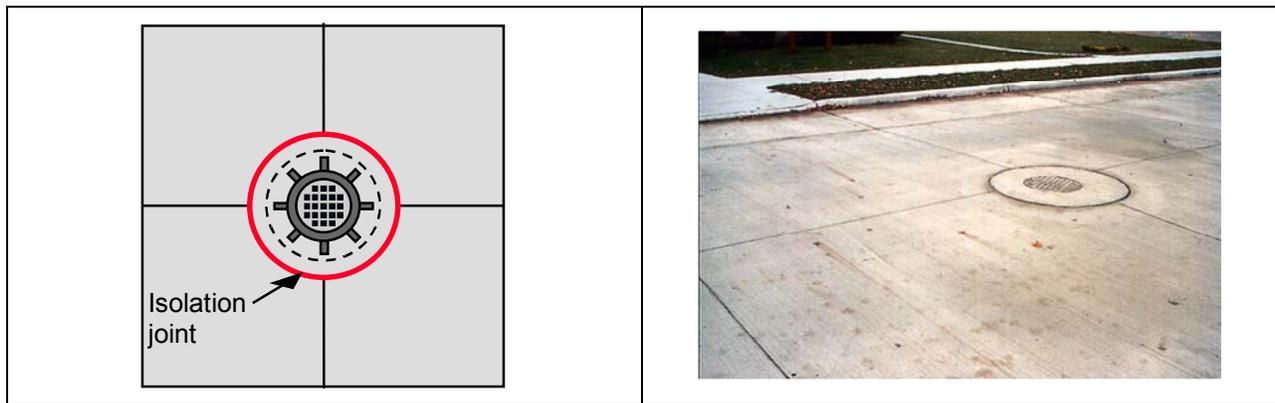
Round boxout (figure and photo courtesy of American Concrete Paving Association).
